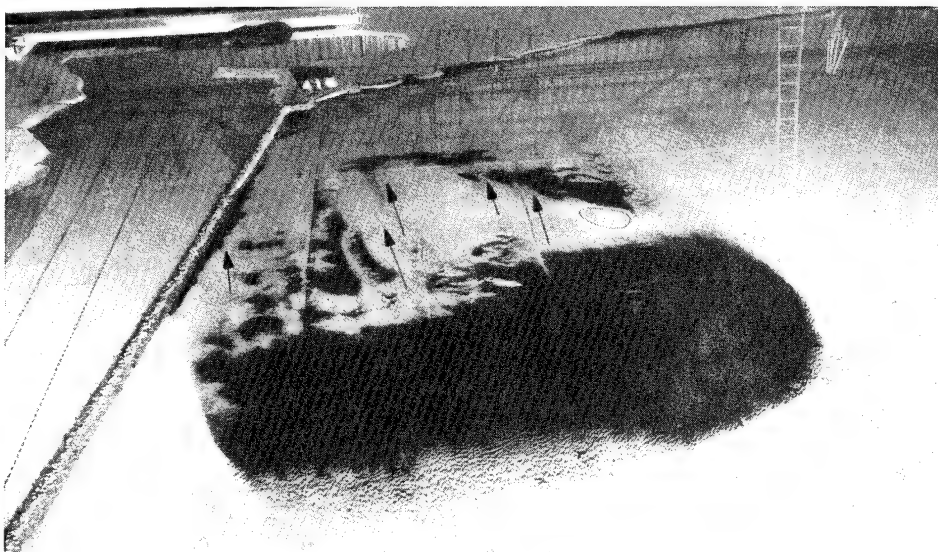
Movement of Plan 4 submerged offshore berm after 2.5 hr of testing; swl = +8.8 ft
